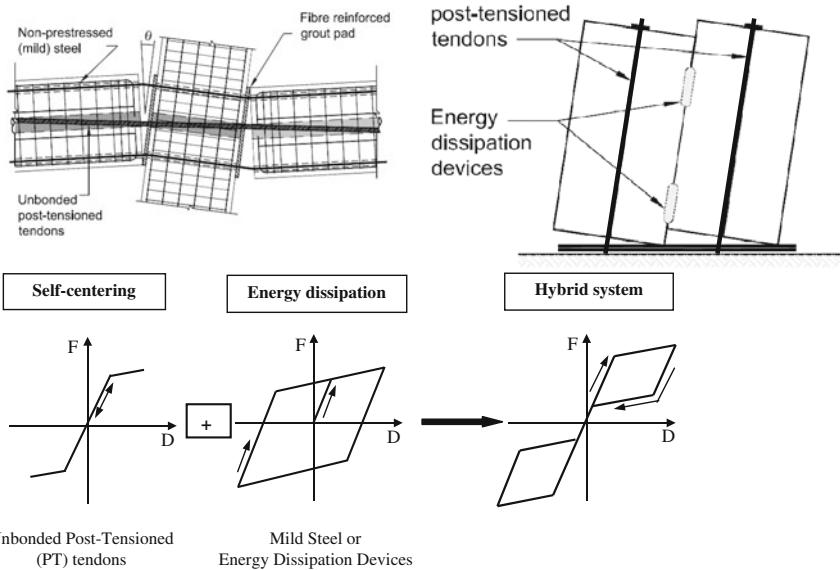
Jointed precast “hybrid” frame and wall connections developed in the US PRESSS-Program
